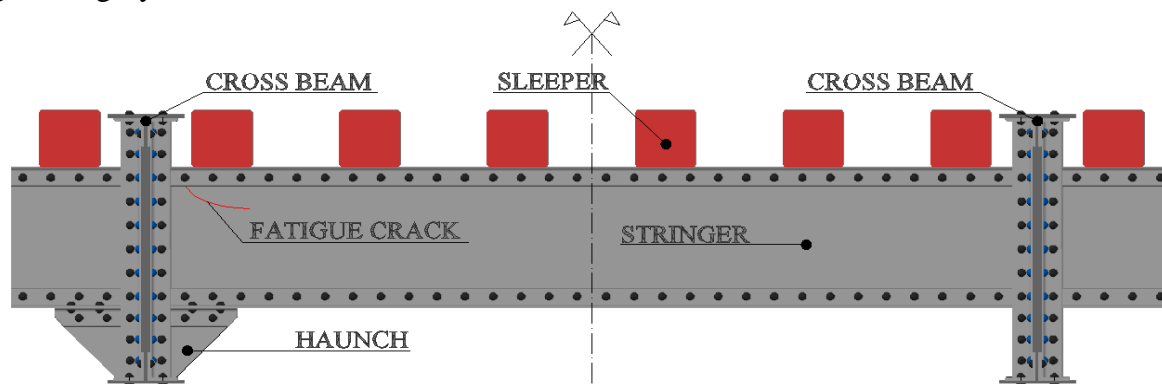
Arrangement of a typical stringer to cross-beam connection with/without reinforcing haunches (example of fatigue crack).
